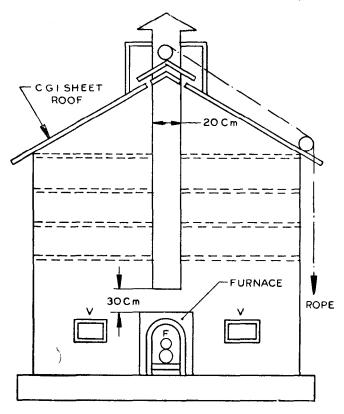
Side Elevation on AD Side (Karnataka Barn)
